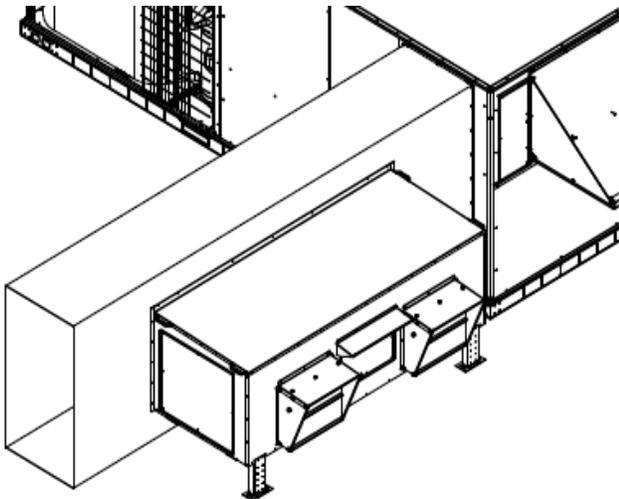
Typical Large Horizontal Power Exhaust Installation
